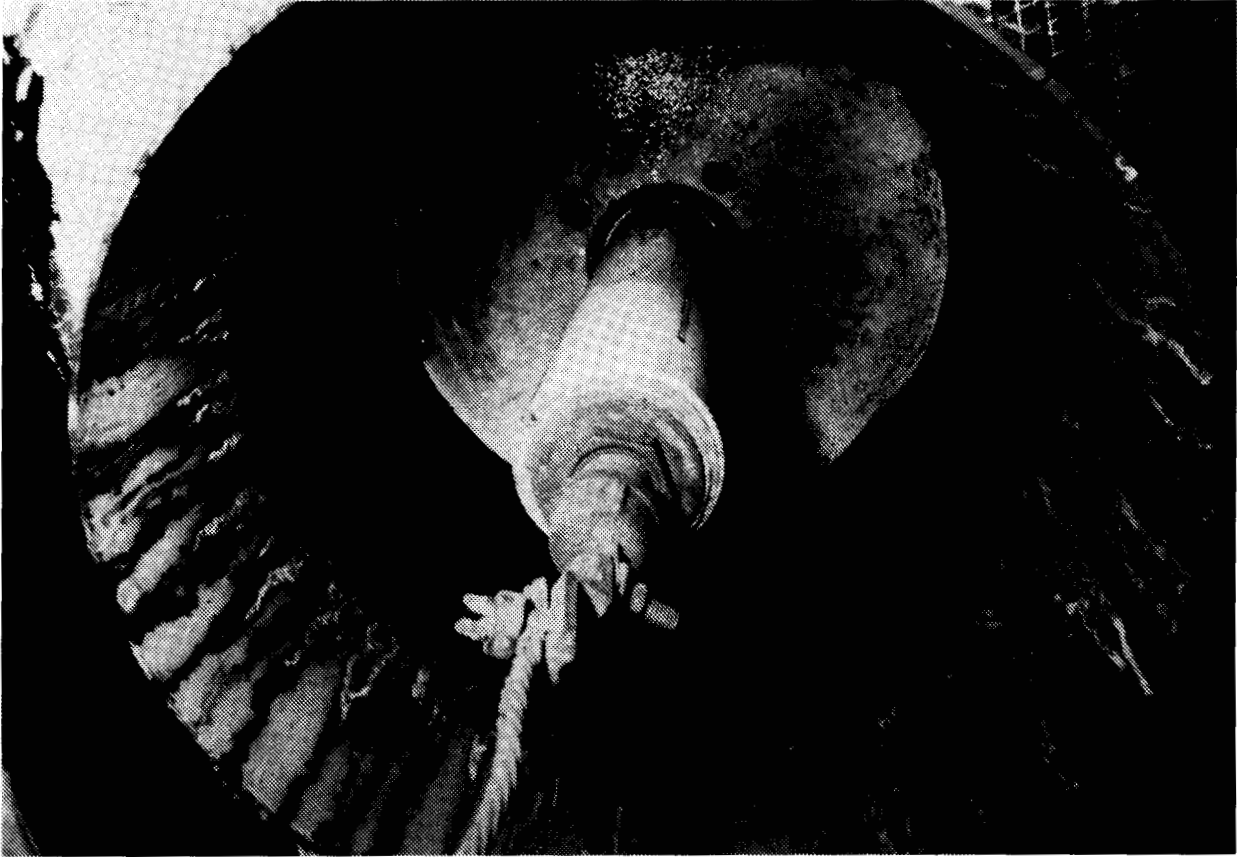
Water patterns caused by cold conduit in the penthouse roof.
